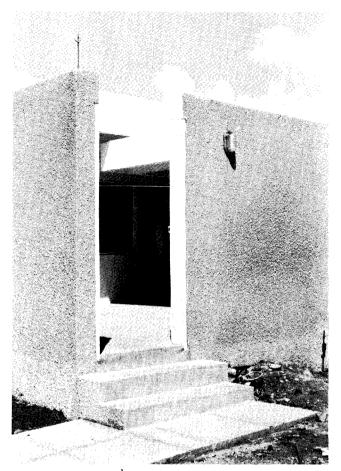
Tyrolean finish on external walls, Principal's residence, Ghana Nautical College, Nungua, 1968. Architect: HANNAH SCHRECKENBACH.
